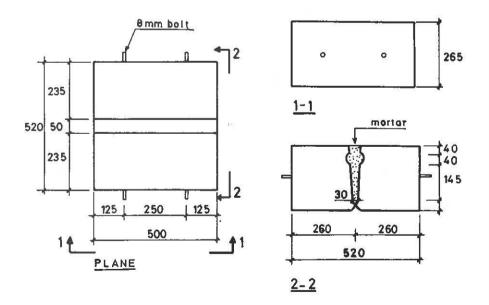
Test specimen of prefabricated concrete element (floor components)
